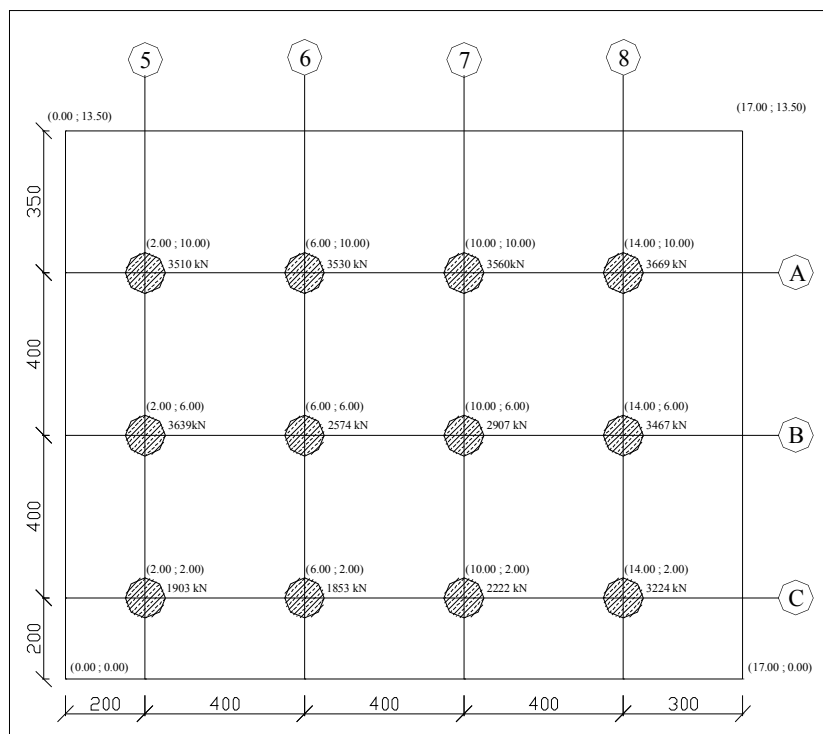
Pile disposition plan and pile loads (12 piles with 25m length)
